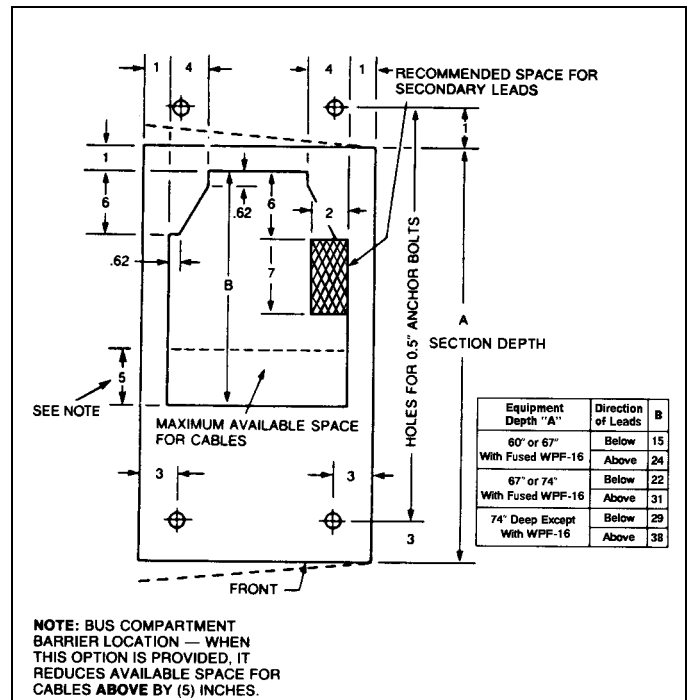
Floor plan and cable entry space - indoor AKD-10
